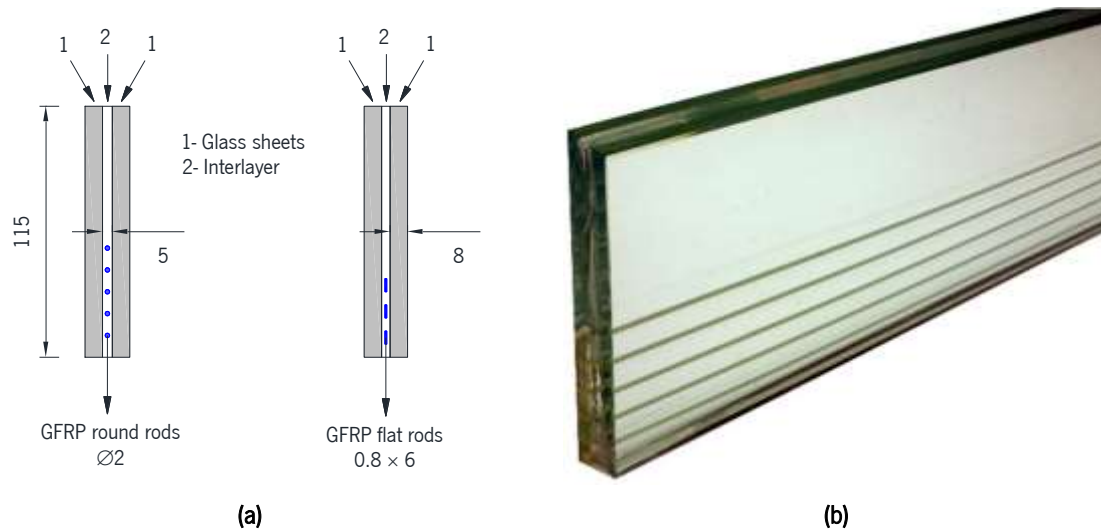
SG-laminated glass beams with embedded GFRP reinforcement tested by Louter *et al.* [60]: (a) cross-section geometry; and (b) specimen. Note: units in [mm].
